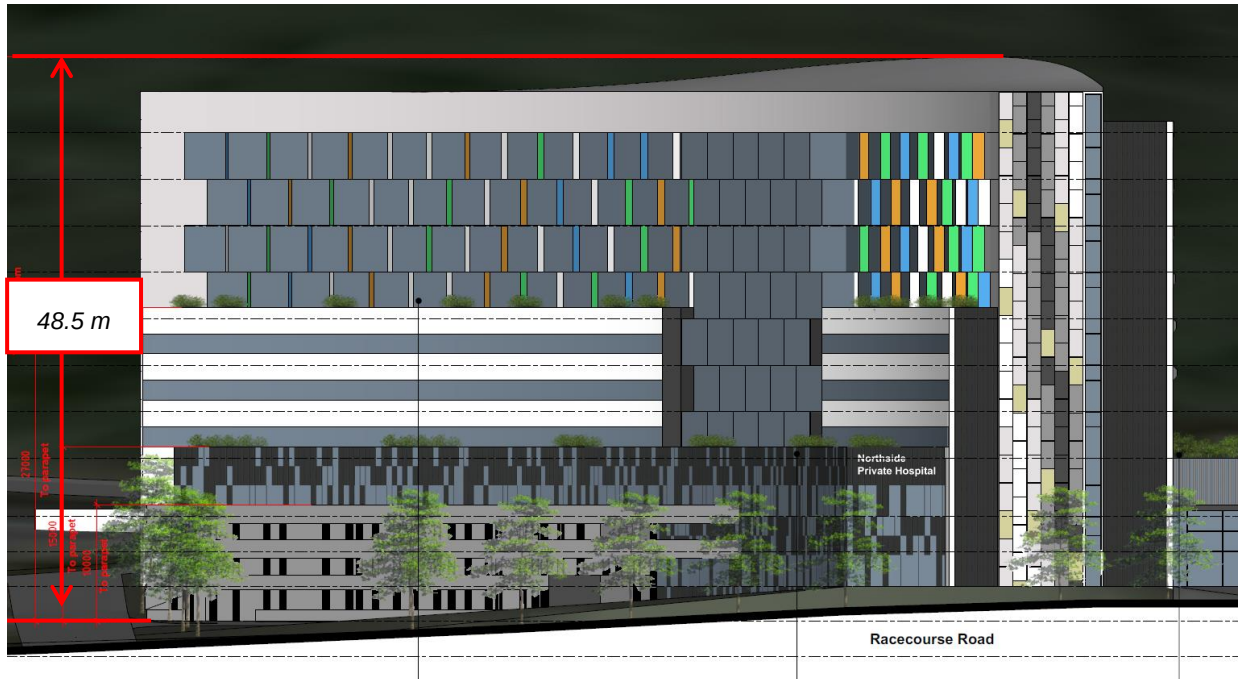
North Elevation of the proposed development (Mar 2019 design).
